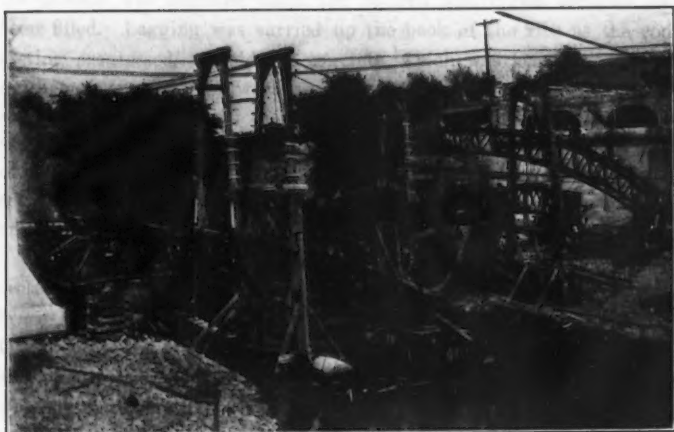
WEST SEVENTH STREET VIADUCT: RAISING EAST HALF OF SOUTH RIB OF ARCH BEFORE THE HIGH WATER.
